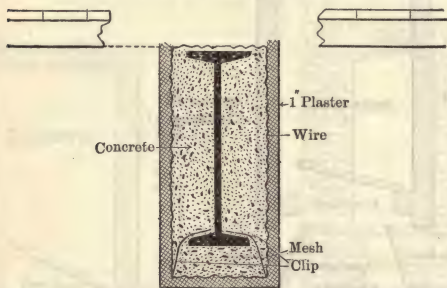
Fireproofing of Steel Beam with Concrete and Plaster
